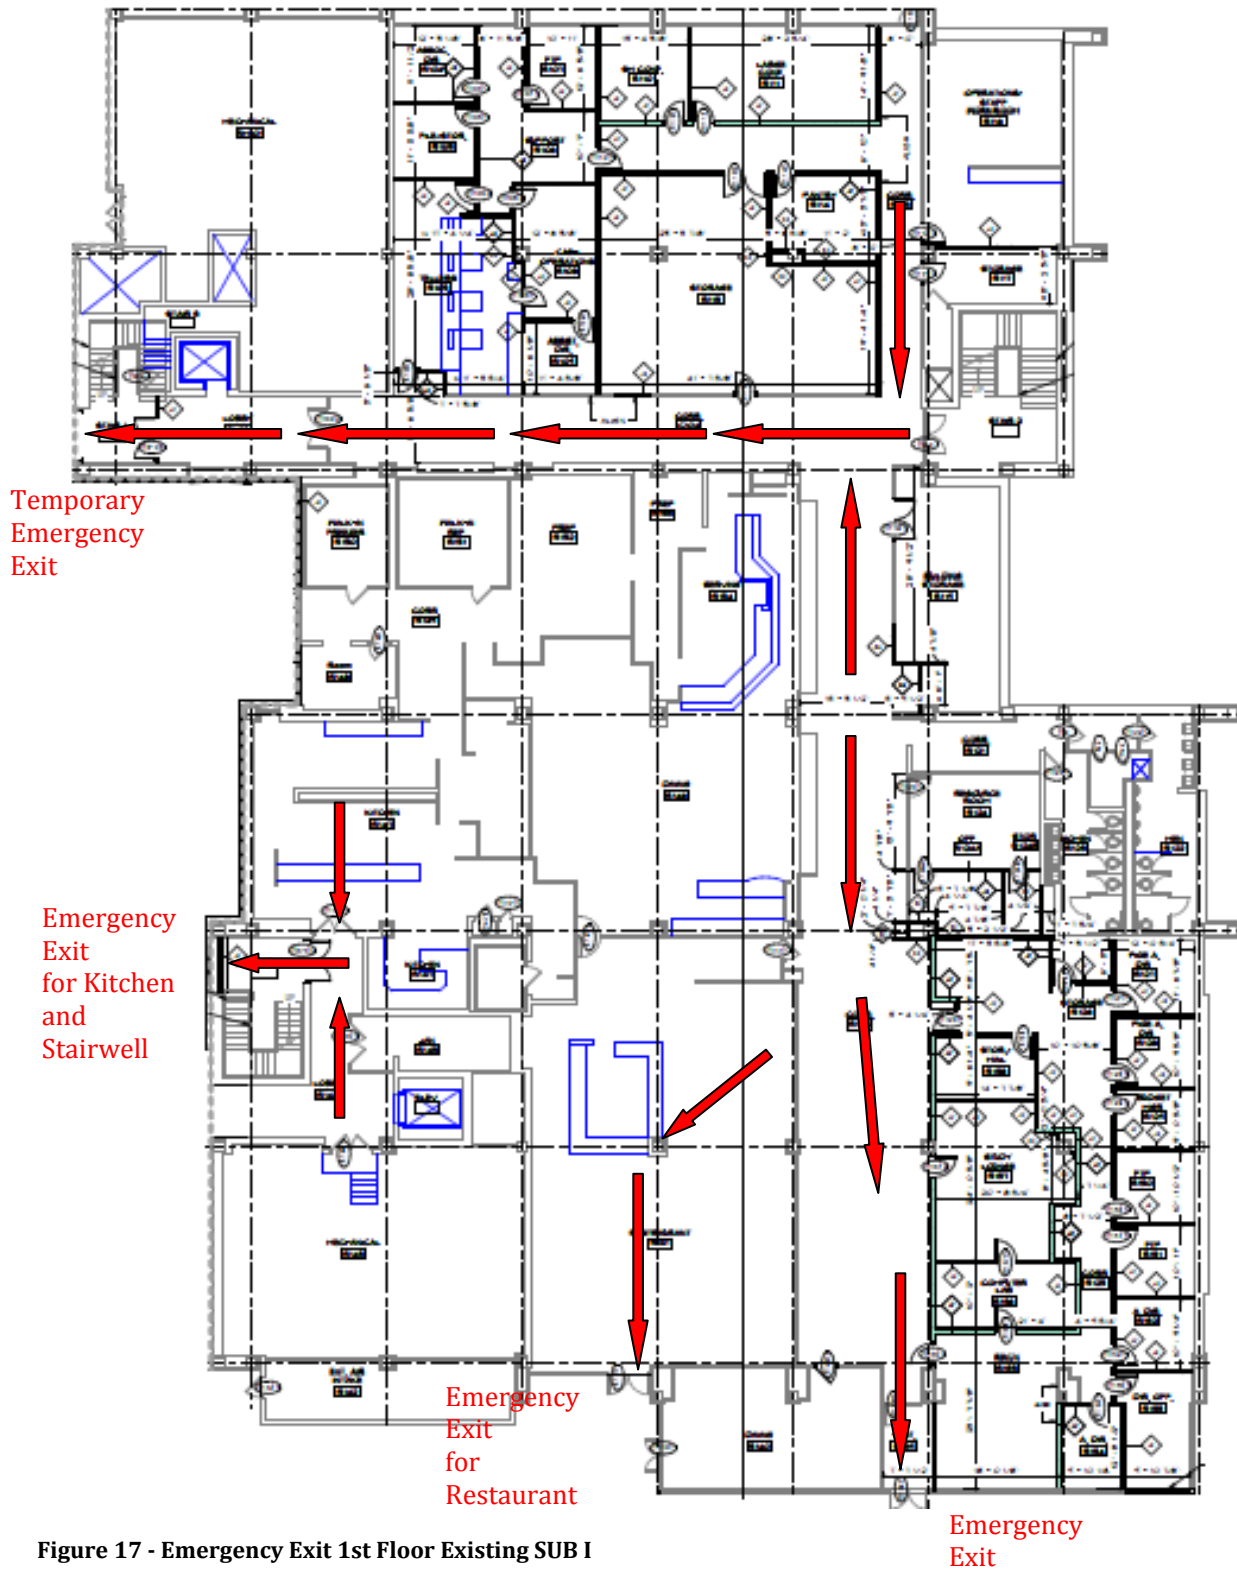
Emergency Exit 1st Floor Existing SUB I
